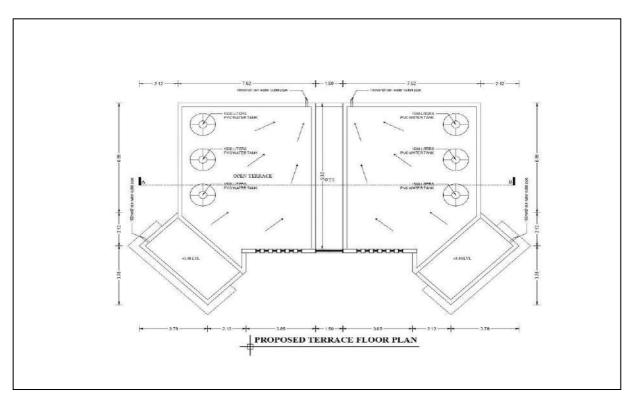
Terrace Floor Plan of Public Toilets & Baths
